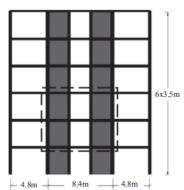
Structural Frame with Steel Plate Shear Wall (SPSW)
